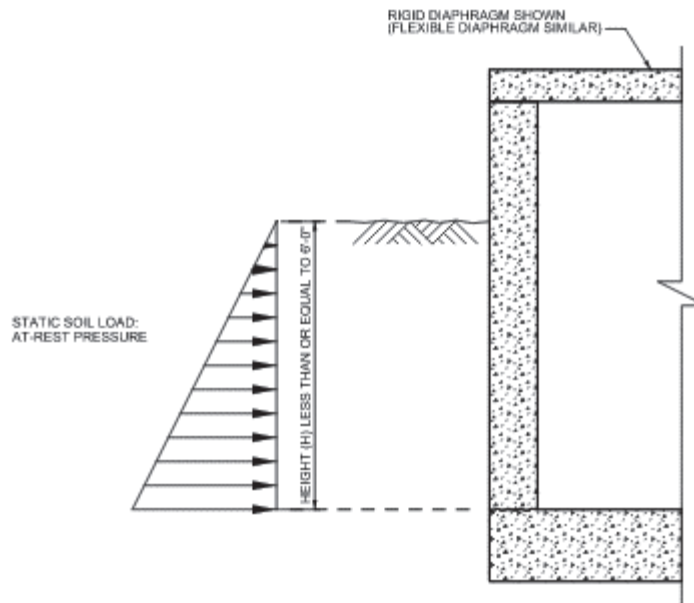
Basement Wall with Backfill height less than or equal to 6'-0"
